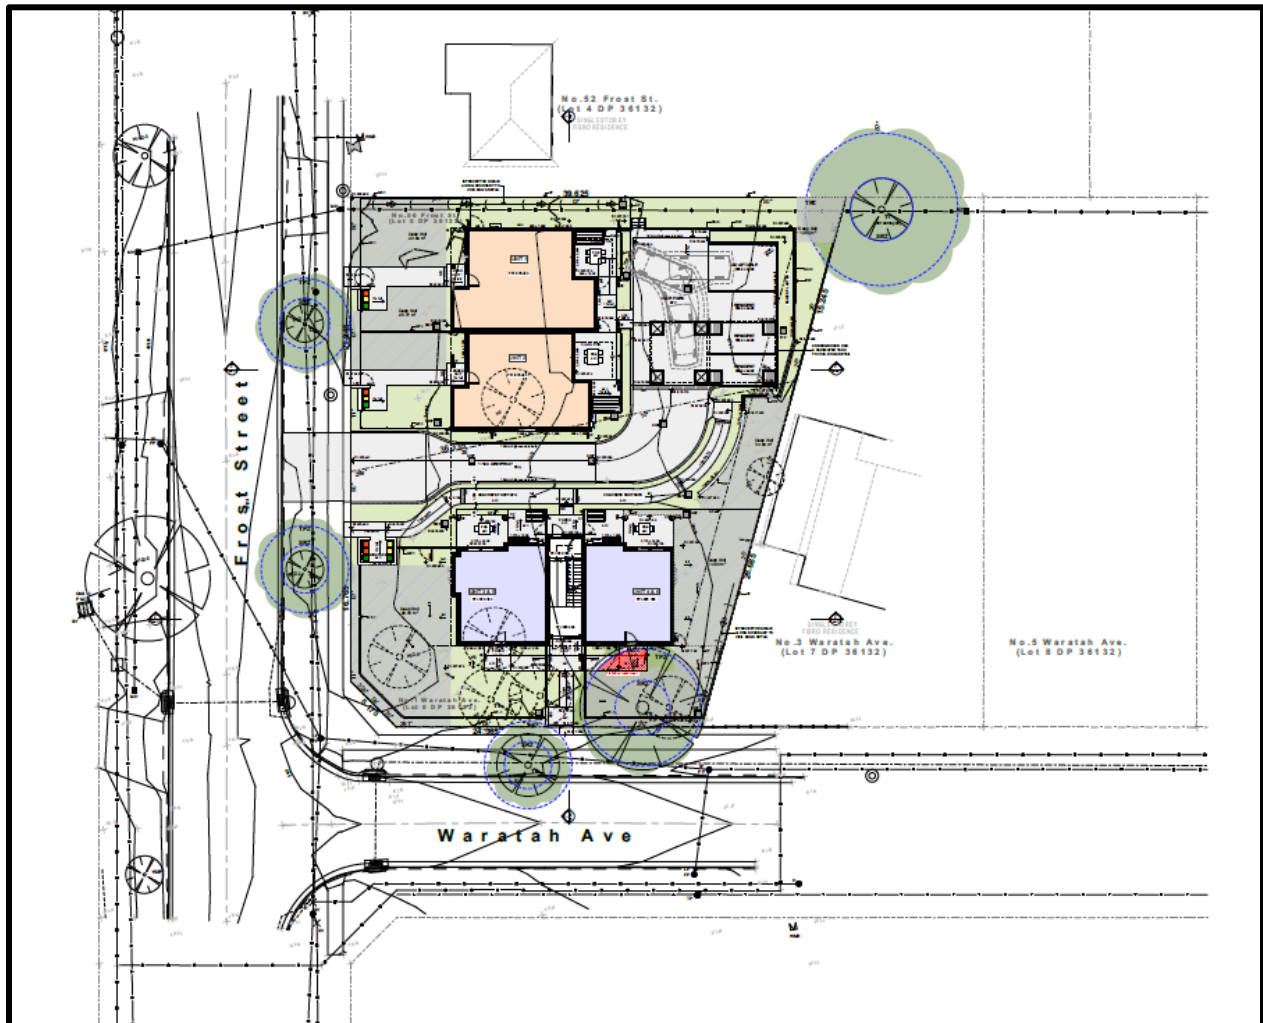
Proposed Site Plan (Source DTA Architects) ``.
